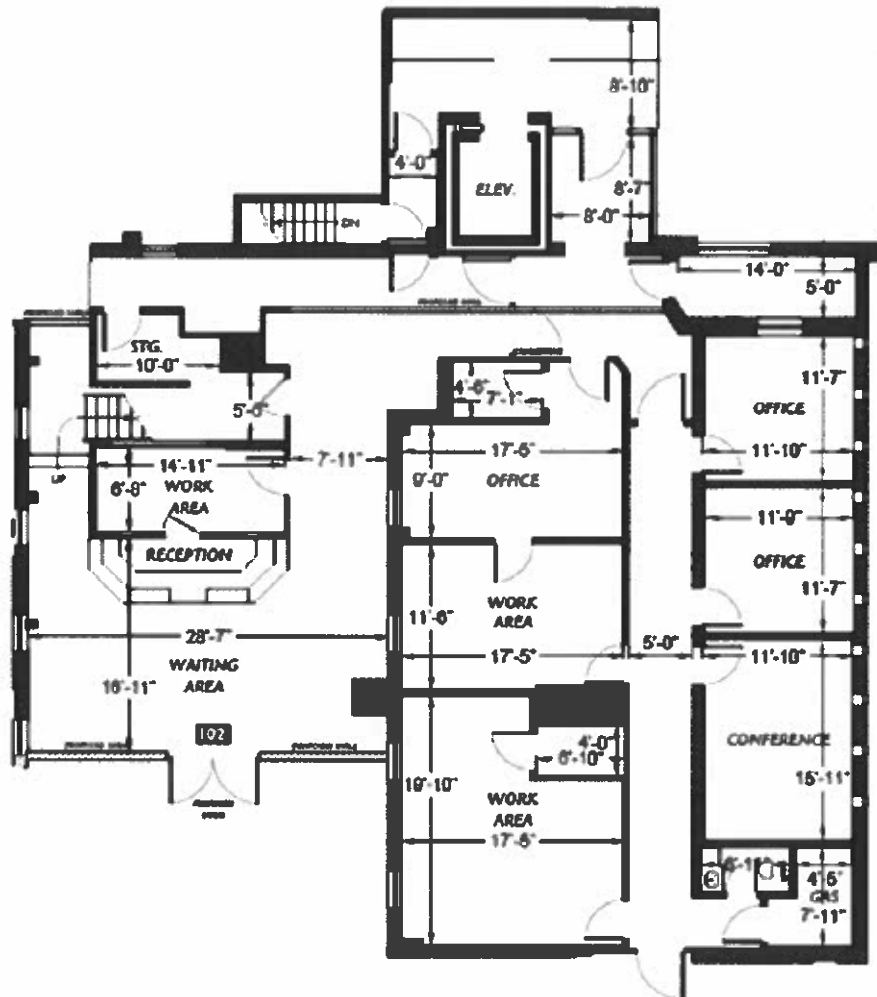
EXHIBIT "A"FLOOR PLAN OF PREMISESLOWER LEVEL
